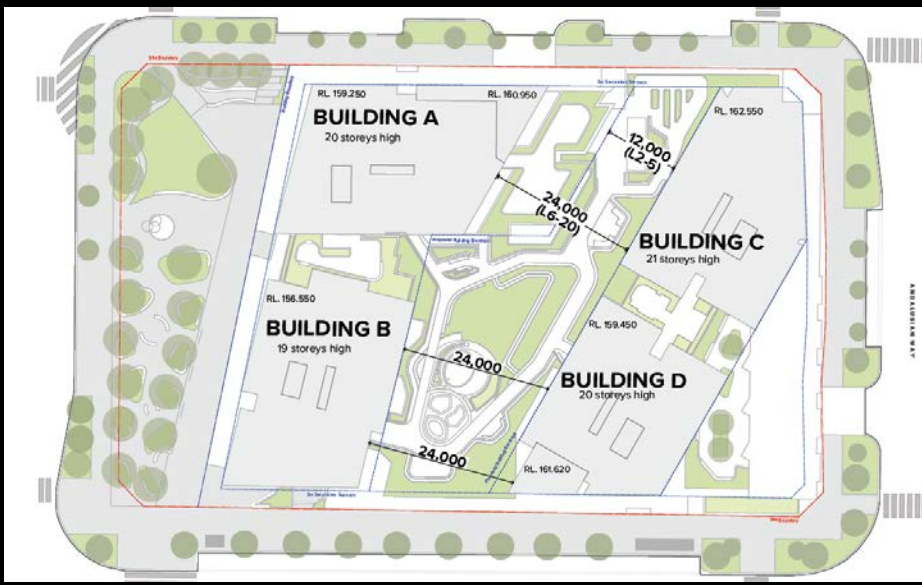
Approved building separation (Source: Concept Approval UDG)
